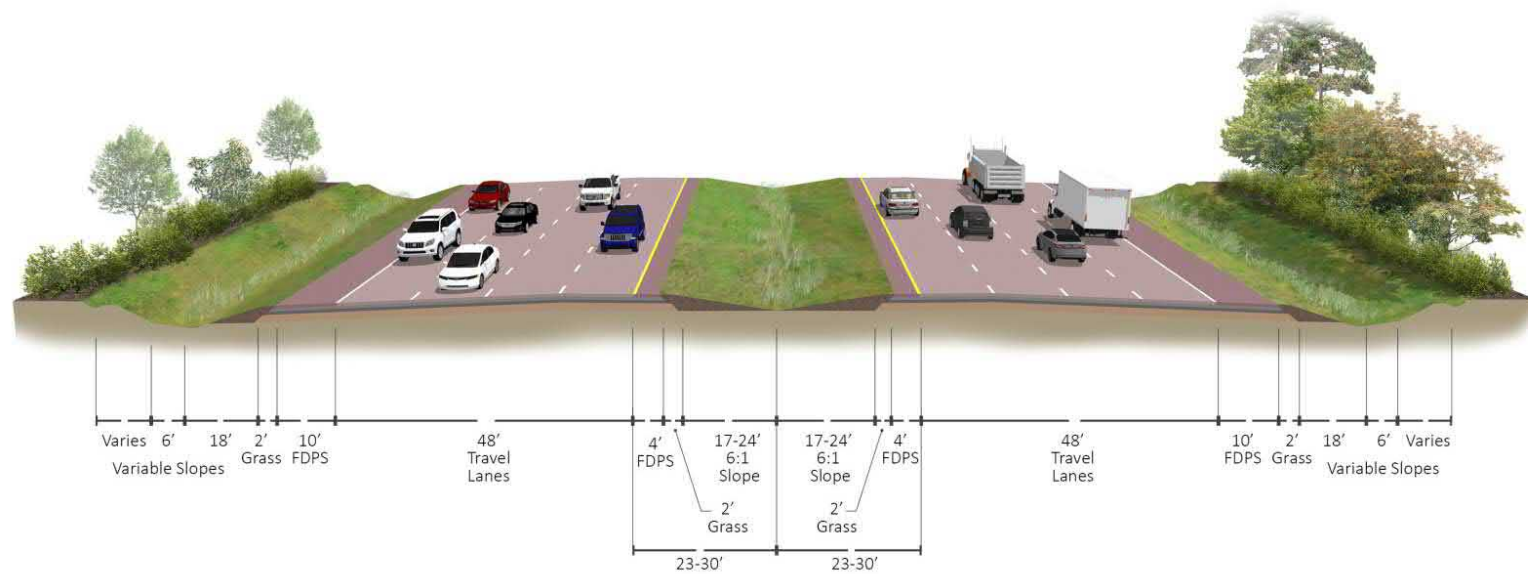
Current Detailed Study Alternatives Typical Section – eight-lane arterial widening
